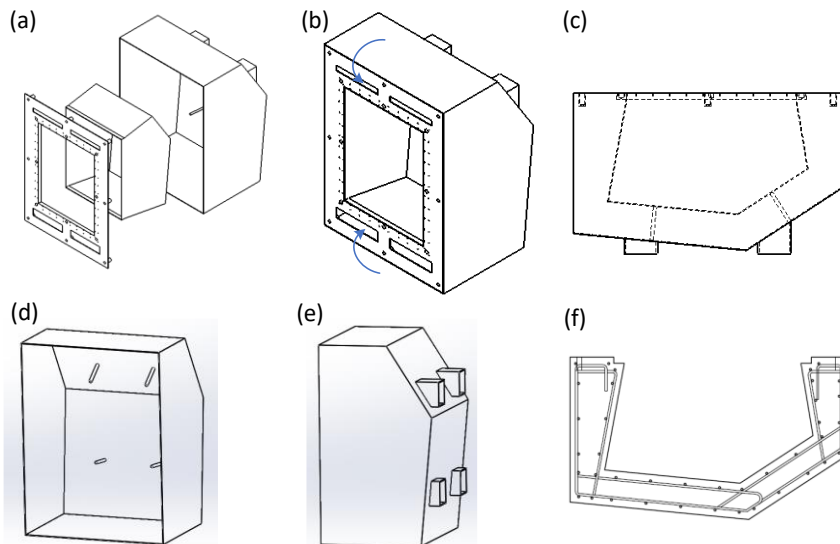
Mould and skeleton design for the concrete construction of Noise-Box: (a) mould disassembly; (b) mould assembly; (c) placement mode for construction; (d) inner part holders; (e) outer part supports; (f) rebar cage reinforce.
